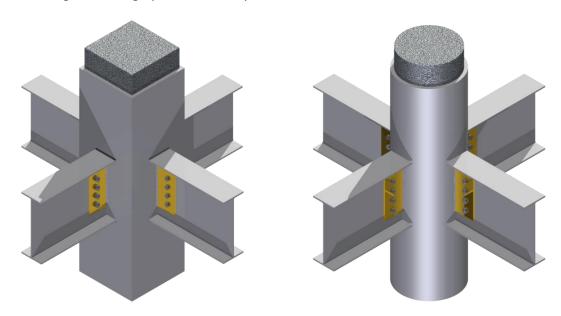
Simple connections between steel beams to concrete filled steel tubular column with fin plates
